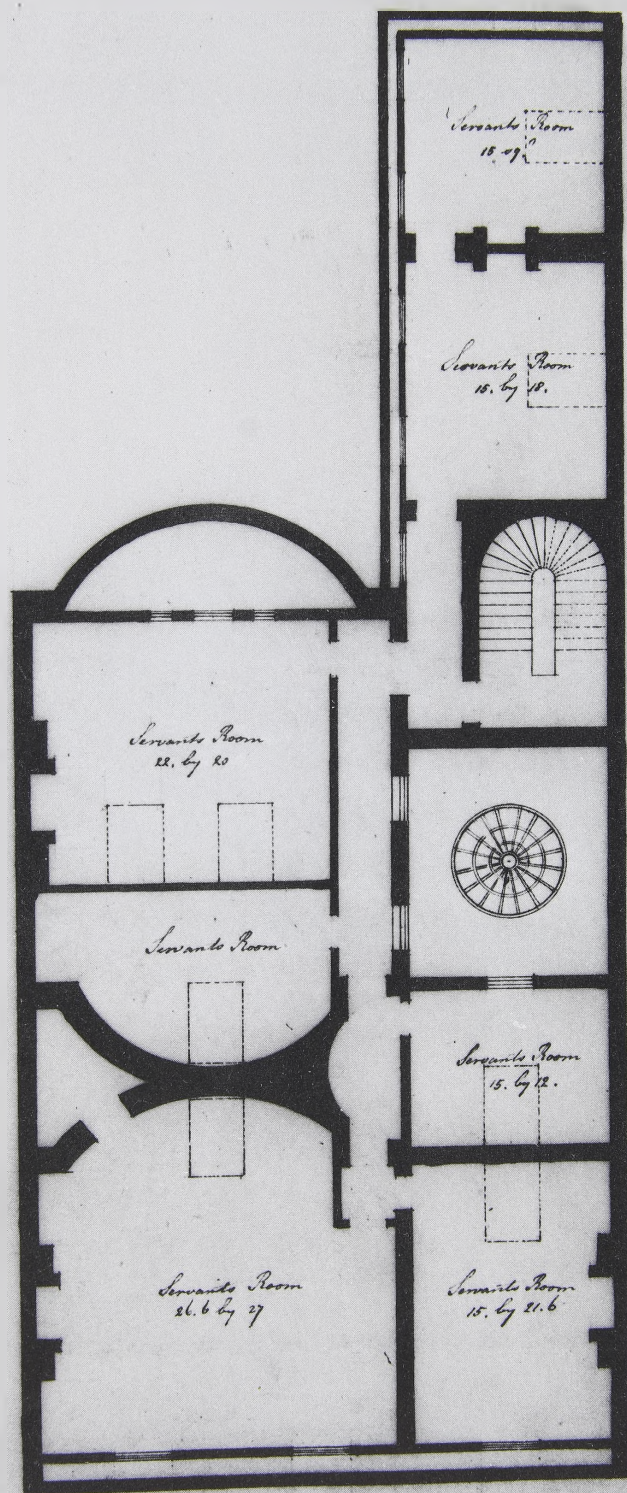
Robert Adam. London, No. 20 St James's Square: Plan of the garret storey, 1772
